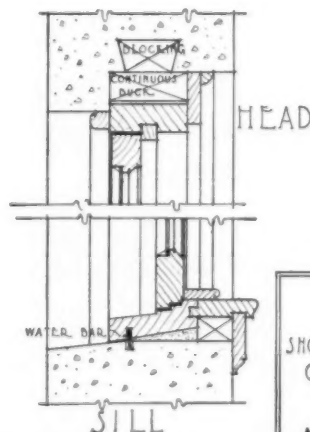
DETAIL "D" AN AUSTRAL FRAME ADAPTED TO STONE WITH HARD WOOD INTERIOR FINISH.
